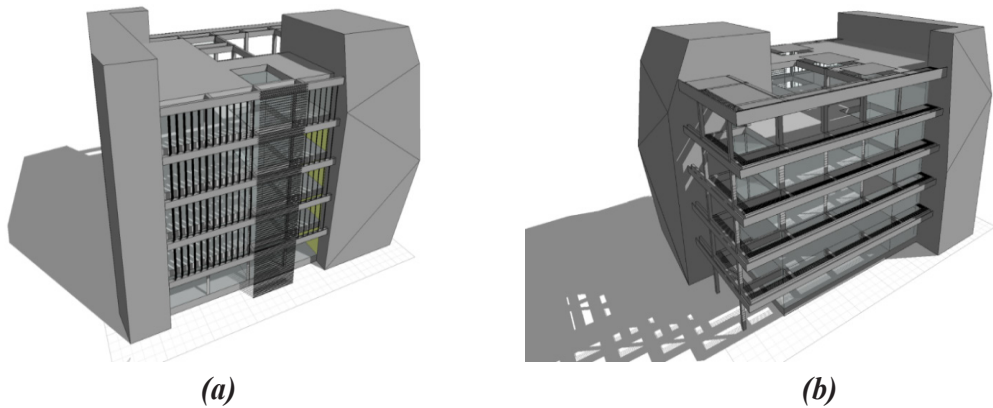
Southeast (a) and Northwest (b) building facade with shading elements
